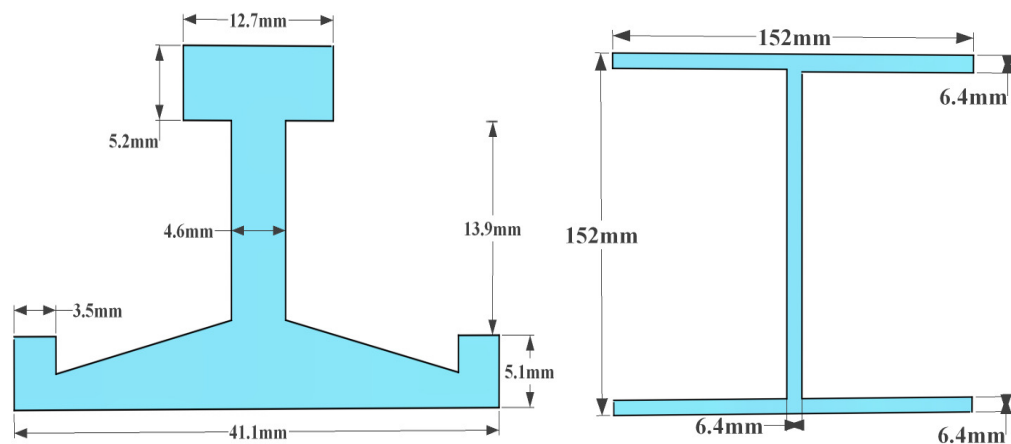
GFRP pultruded T and I-section profiles (Not to scale)
